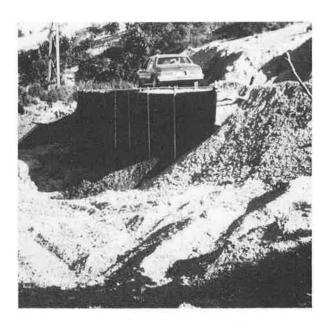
TEST WALL NO. 3, BACKFILLED
